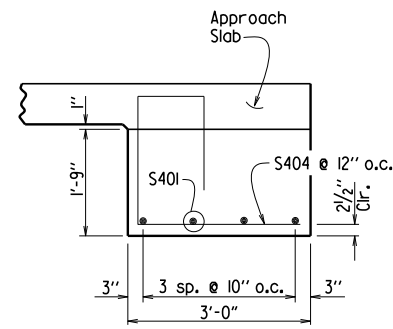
DETAILS OF LONGITUDINAL CONSTRUCTION JOINT
